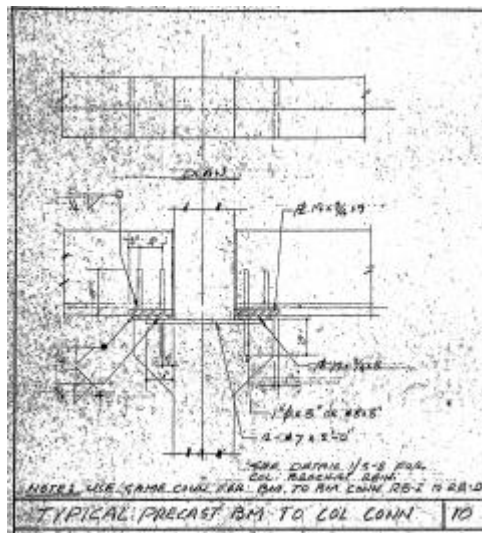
Pre-Cast Beam to Column Corbel Connection
